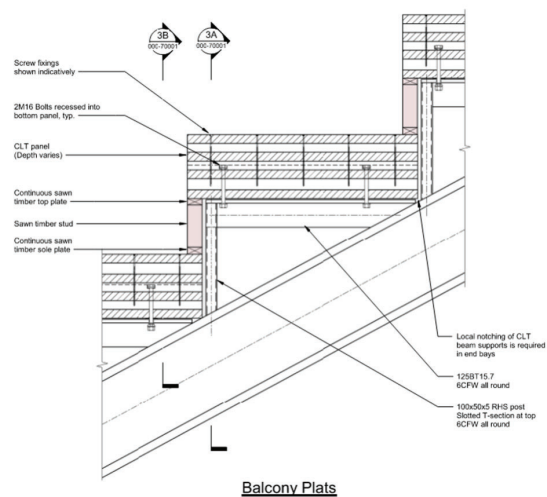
Typical detail of balcony CLT (Courtesy: Arup)
